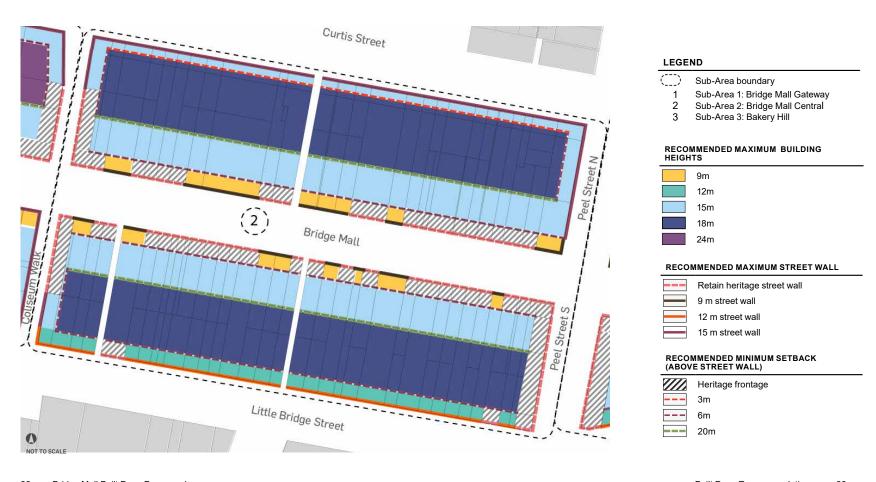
Built Form Framework Plan for Sub-Area 2: Bridge Mall Central
